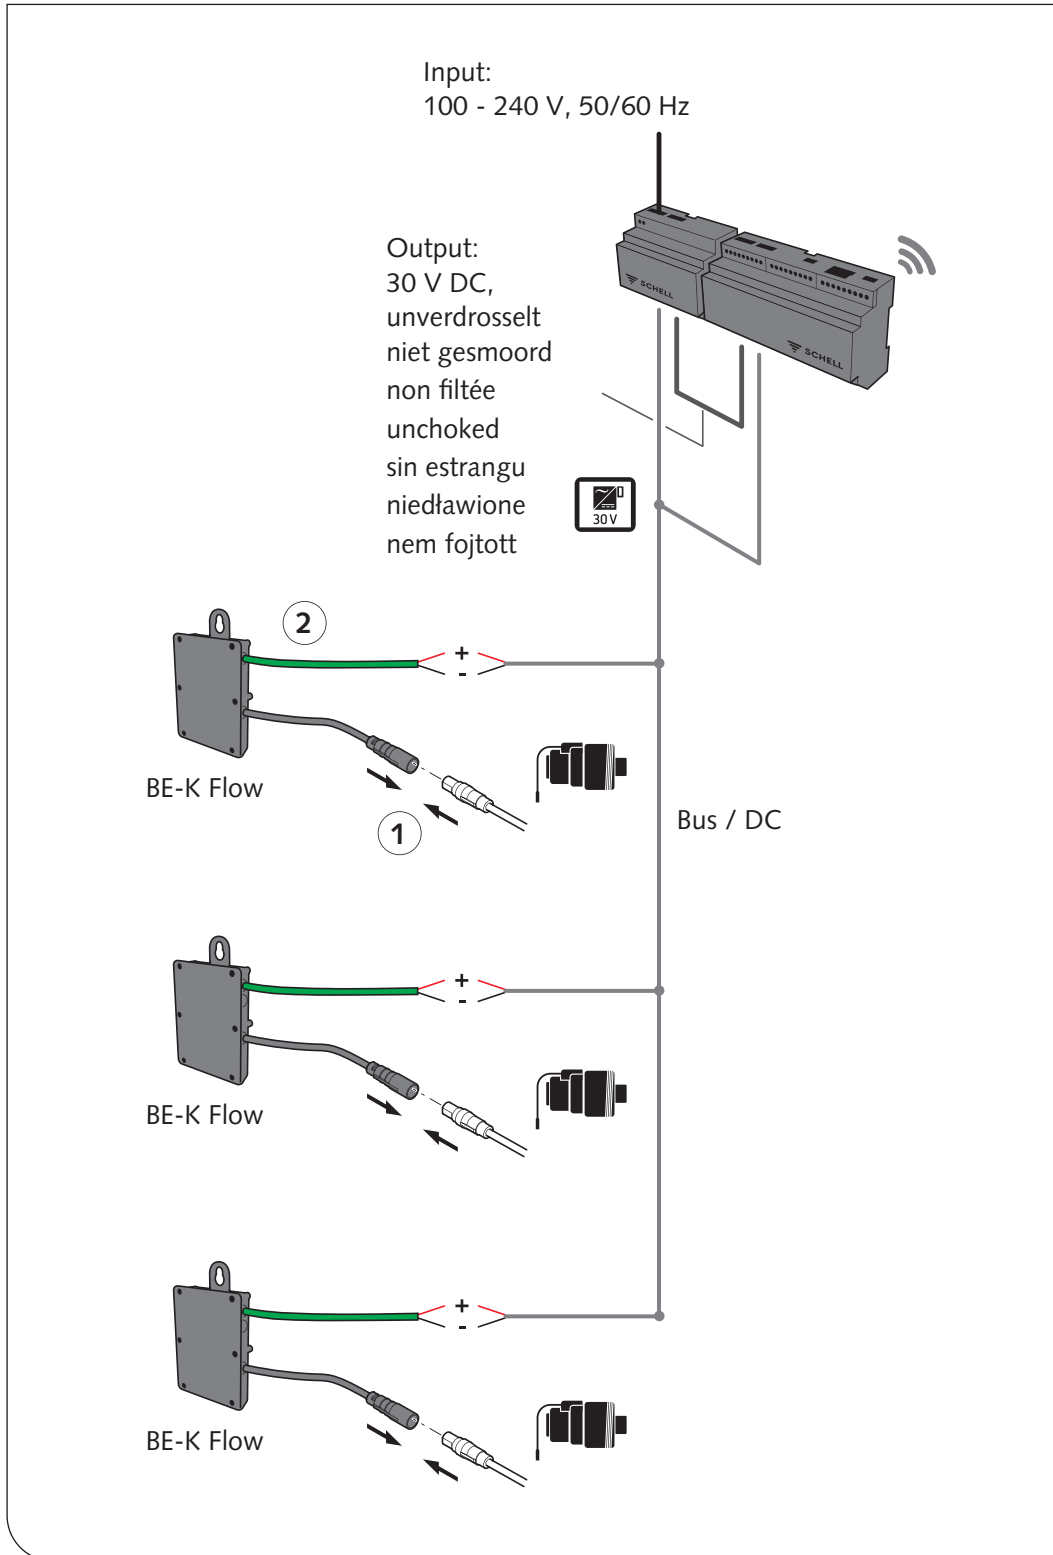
Connecting BE-K Flow, solenoid valve and power supply
